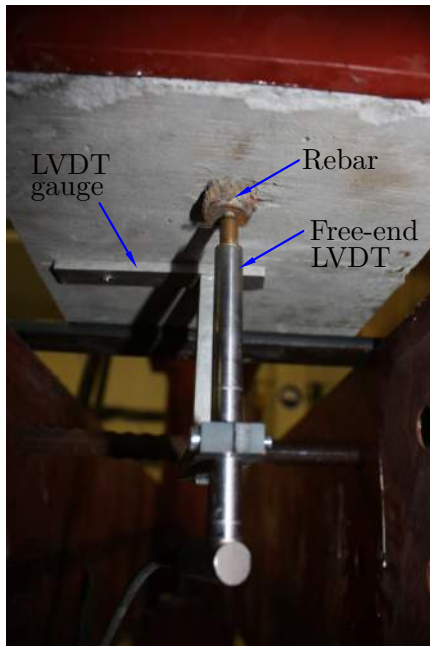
The free-end LVDT fitted to a manufactured gauge at the bottom of the specimen, taking the free-end slip measurements. This corresponds to LVDT position 2 in Figure 3.27.
